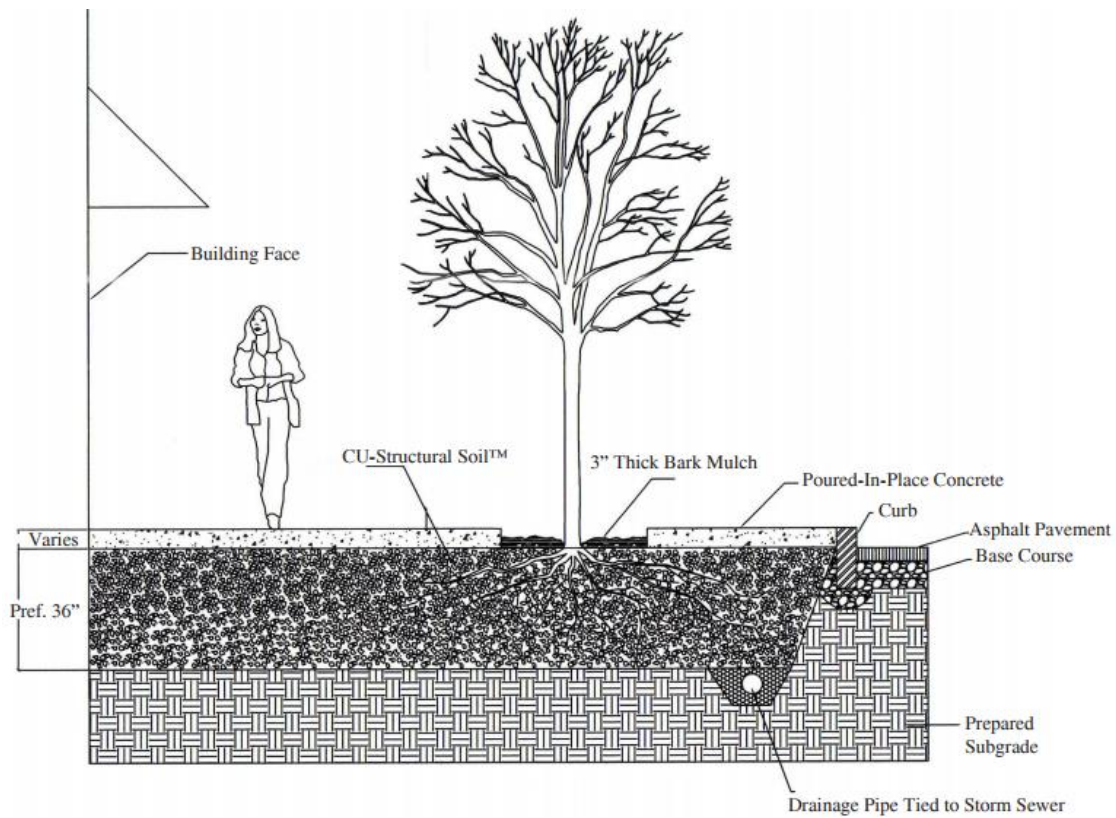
Typical street tree planting using CU-Structural Soil™ under a sidewalk
